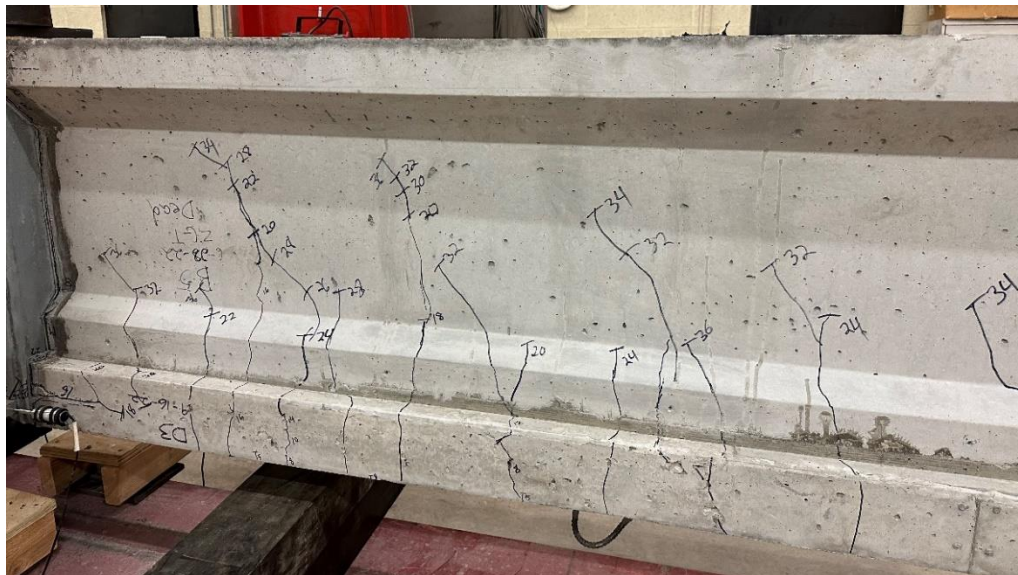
West side of south girder SSDU-1 showing flexural cracks after negative moment test
